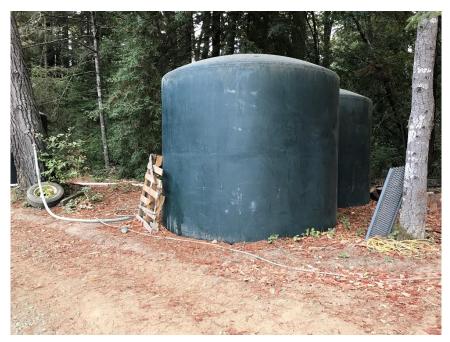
Existing raw water storage tanks at the water infrastructure site.
